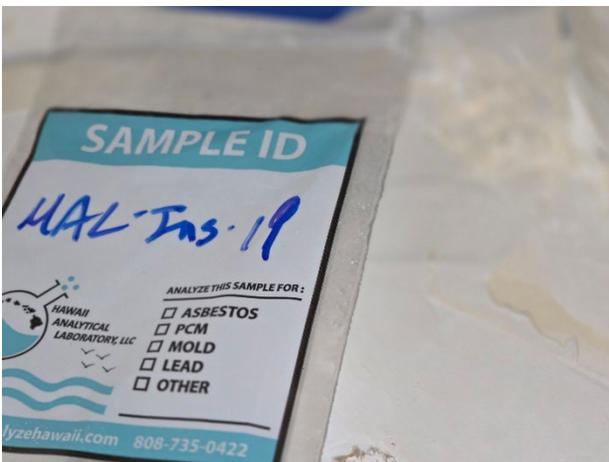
Sample ID: MAL-Ins-19 White joint compound. Above Drop Ceiling. Bathroom.
